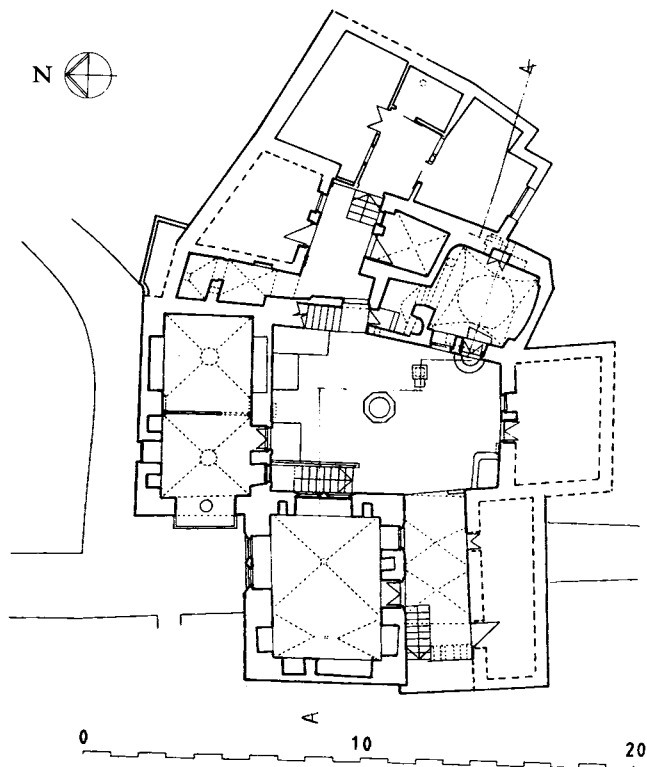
First floor plan of Bait Mamluk, Tariq al-Shaikh Rihan, Jerusalem.
